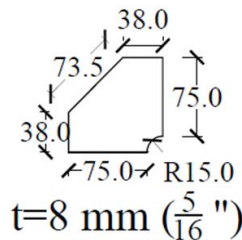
Dimensions of the smaller connection stiffeners found in L and LT Specimens.
